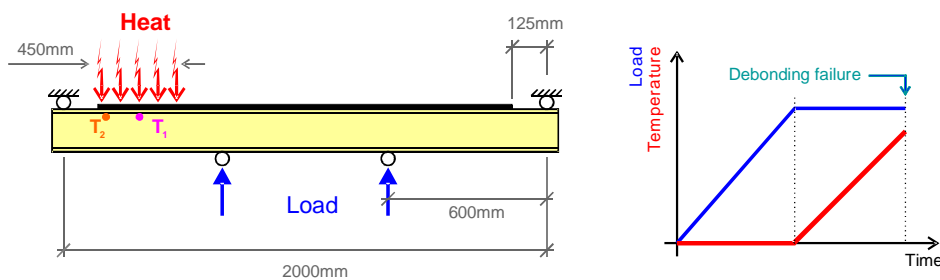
(a) Test Arrangement & (b) Loading and Heating History
